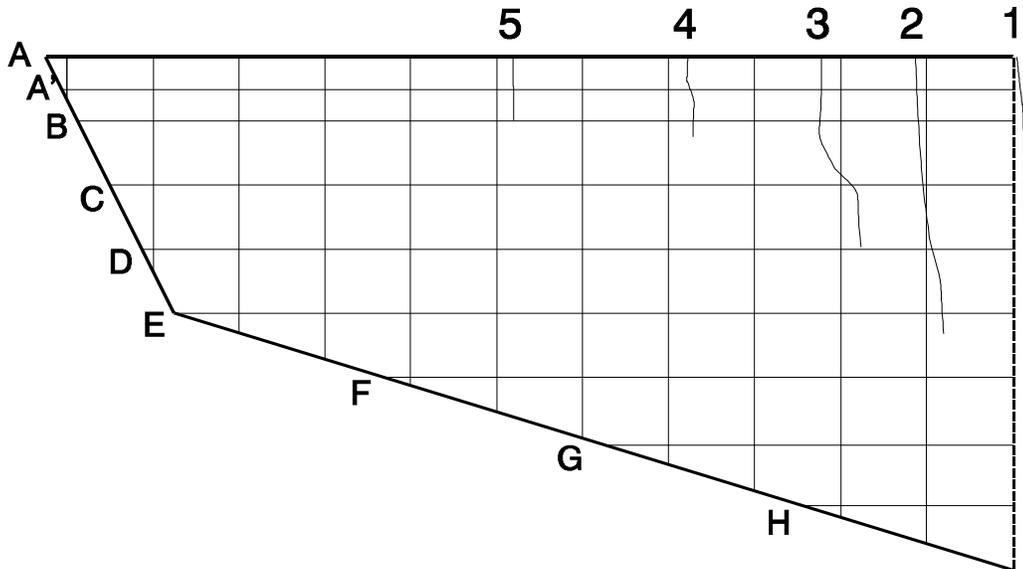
POJ-RC-100 cracking pattern on south face of overhang at dead load
